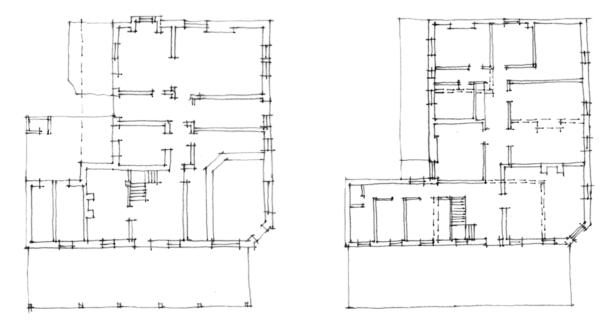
Crown and Anchor Hotel development 1928, , ground floor (left) and first floor (right)
